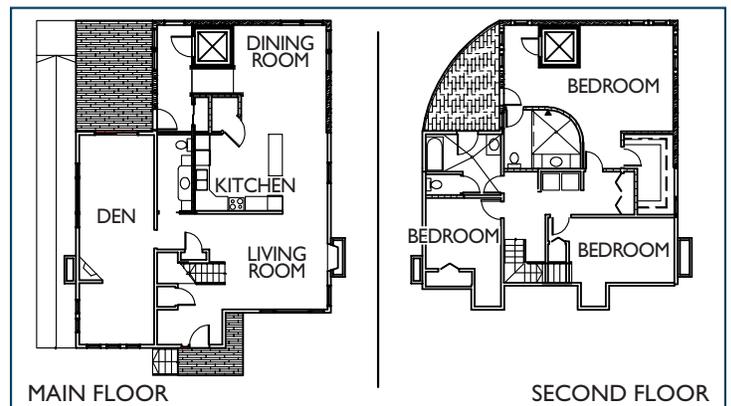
Main- and second-floor plans of home after the accessibility renovations
